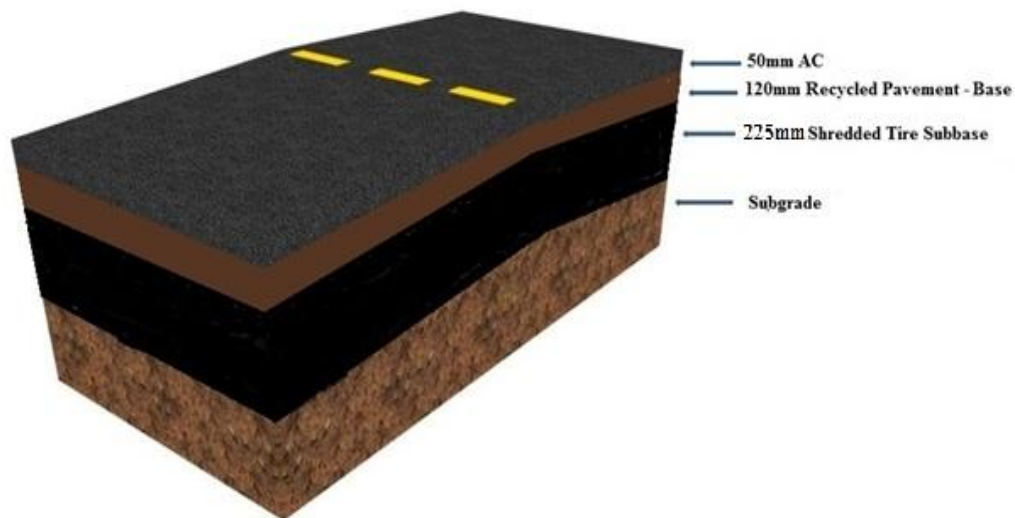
Shredded Tire Test Section (Adolph Way)
